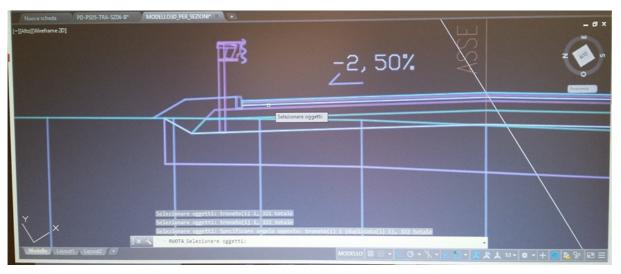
CAD drawing of a road cross section: a source to redesign each road component profile as a 3D polyline
